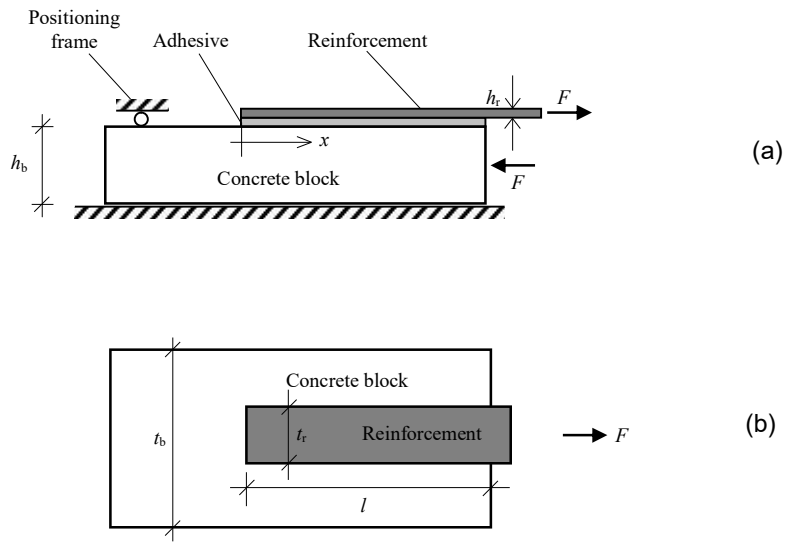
Single-lap shear test geometry: elevation (a), top view (b).
